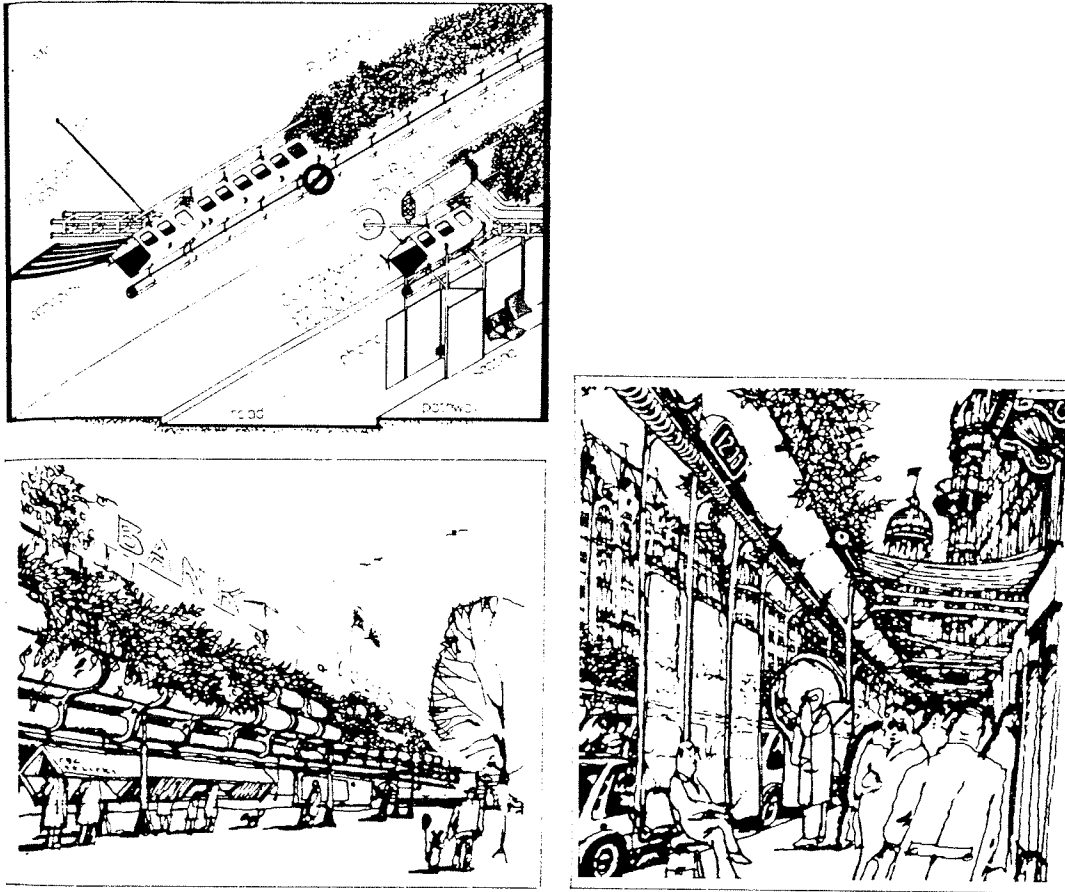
Hydroponic 'Street Roofs' (From Sitta, 1983.)
